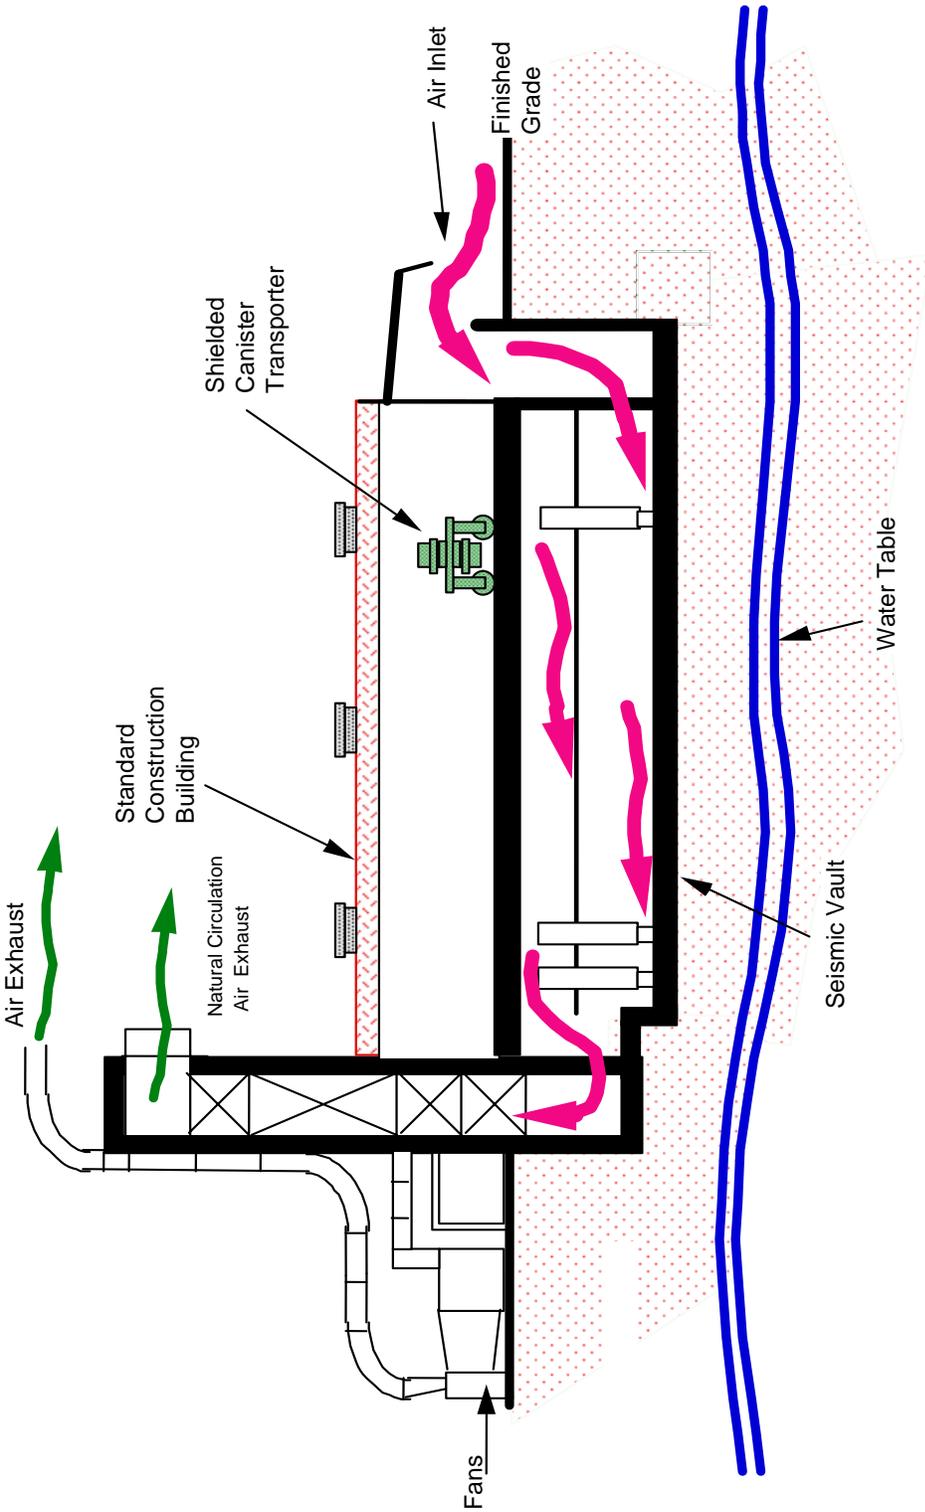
Glass Waste Storage Building #1 Cross Section
